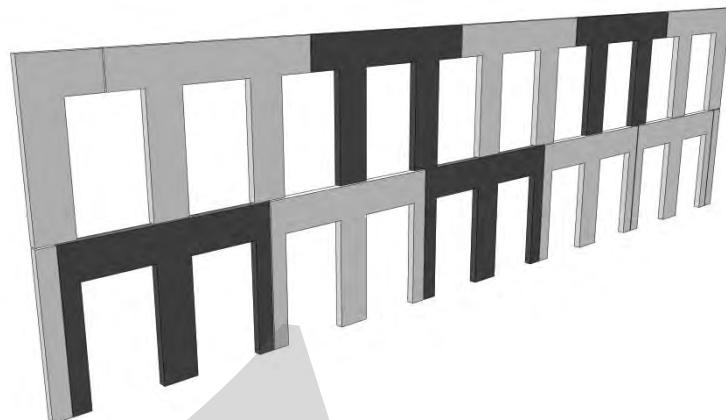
Frame system with Pi or M-shaped wall frames
